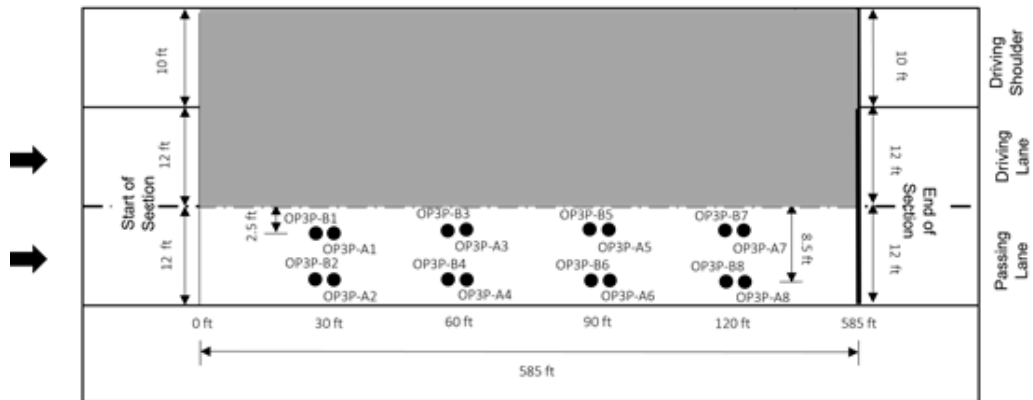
Cell 21 Sampling Plan (not to scale)
